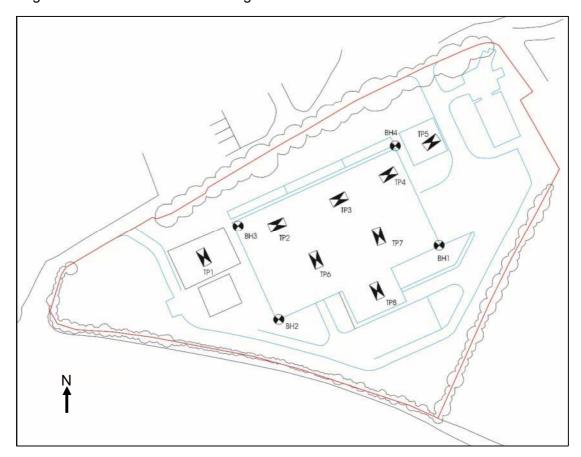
Trial Pit and Borehole Location Plan (Not to Scale)
